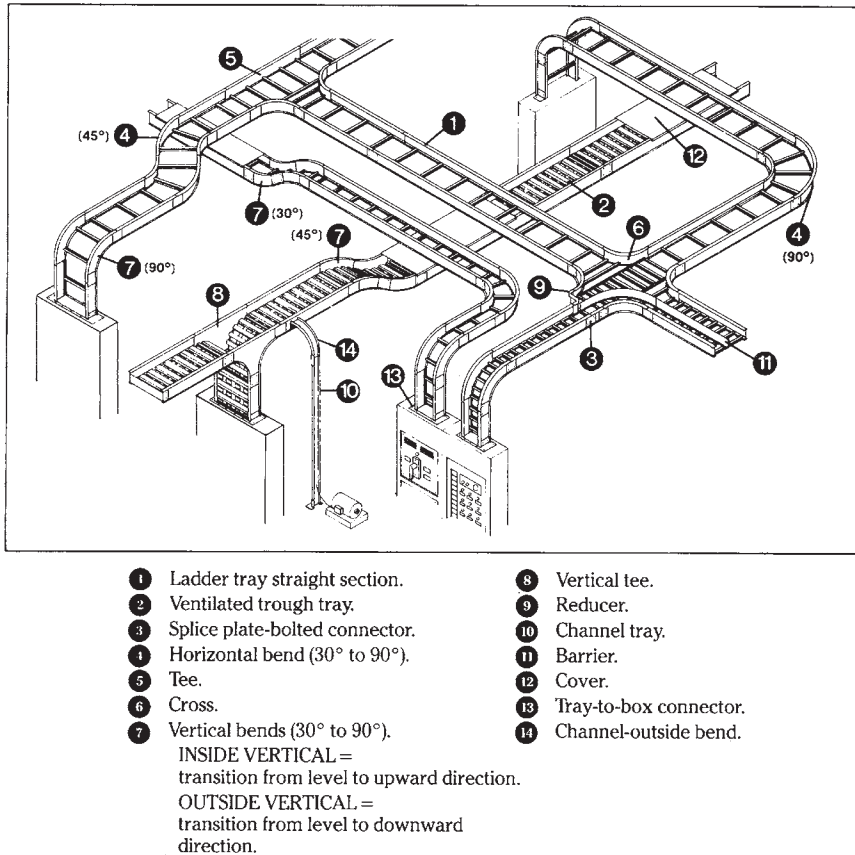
Industrial cable tray raceway design (Courtesy Chalfant Manufacturing Co.)
